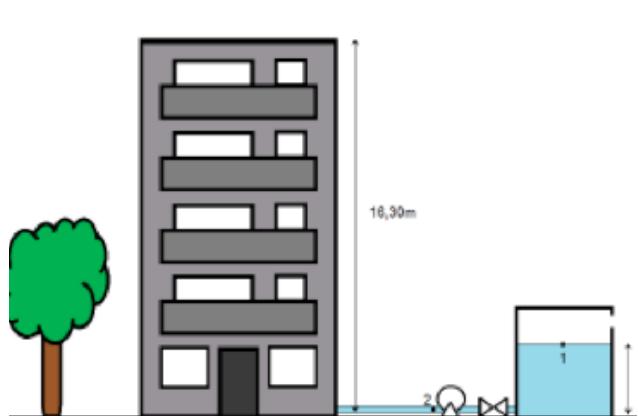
Scheme of a water supply system: from a reservoir with an external centrifugal pump to a building with 5 floors and 5 houses (Maia, and Sousa, 2011)
